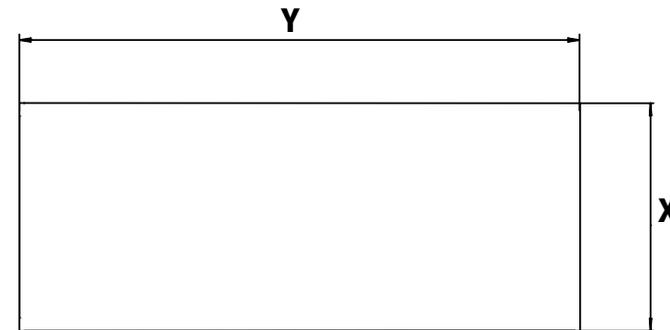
OPENING SIZE / DIMENSION DE L'OUVERTURE
